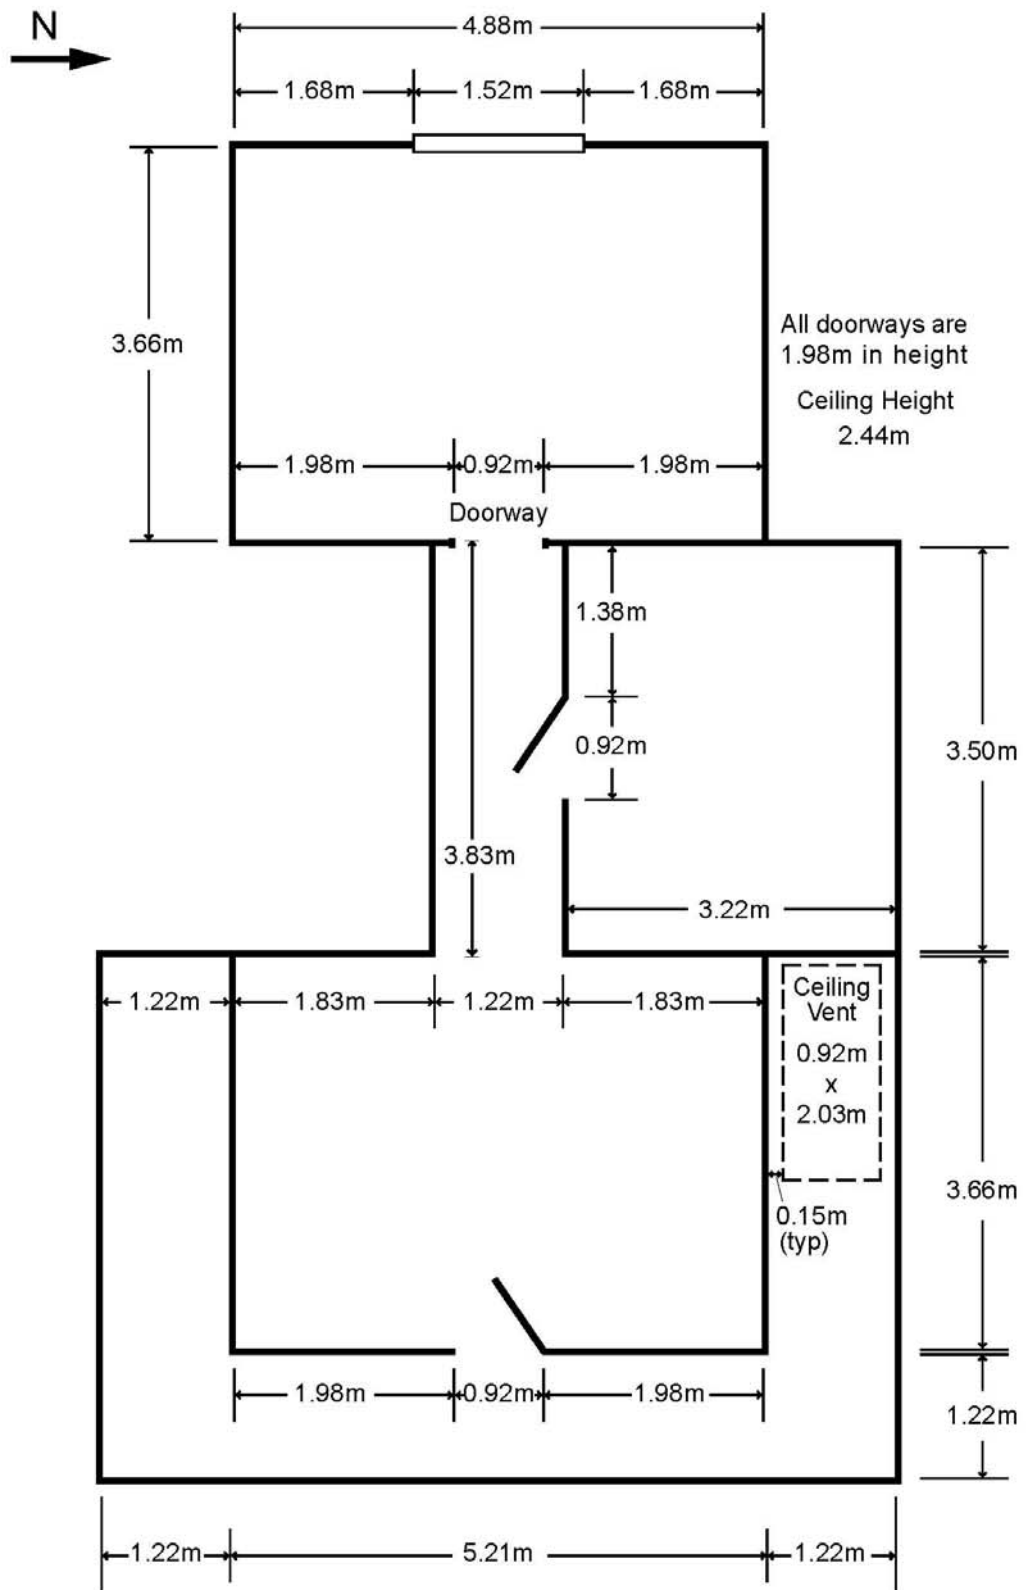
Dimensioned floor plan of experimental structure.
